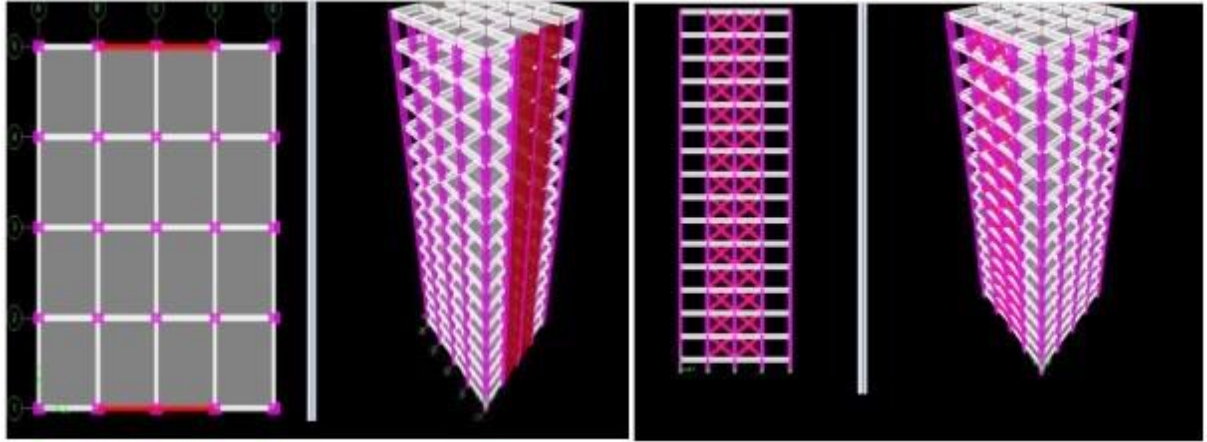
Model showing shear walls and double diagonal bracing in building (Ahmed. J et al (2013))
